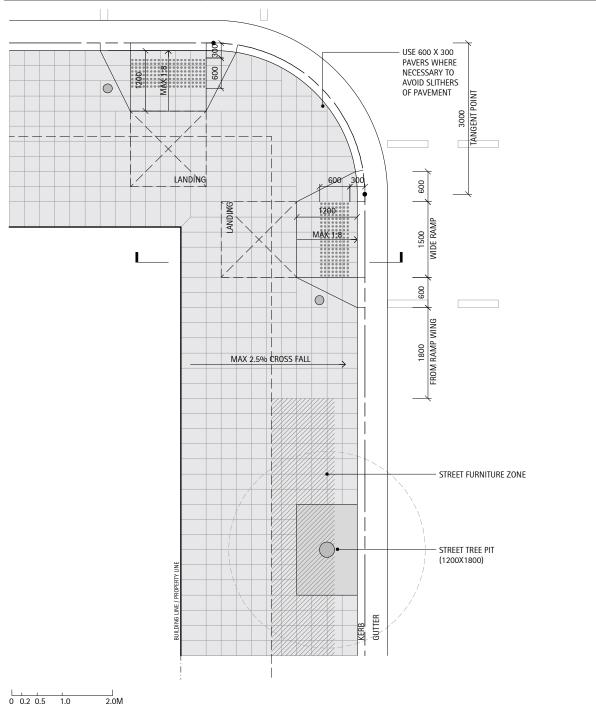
Streets Corner Plan: 3000 Radius 1500 Ramp
